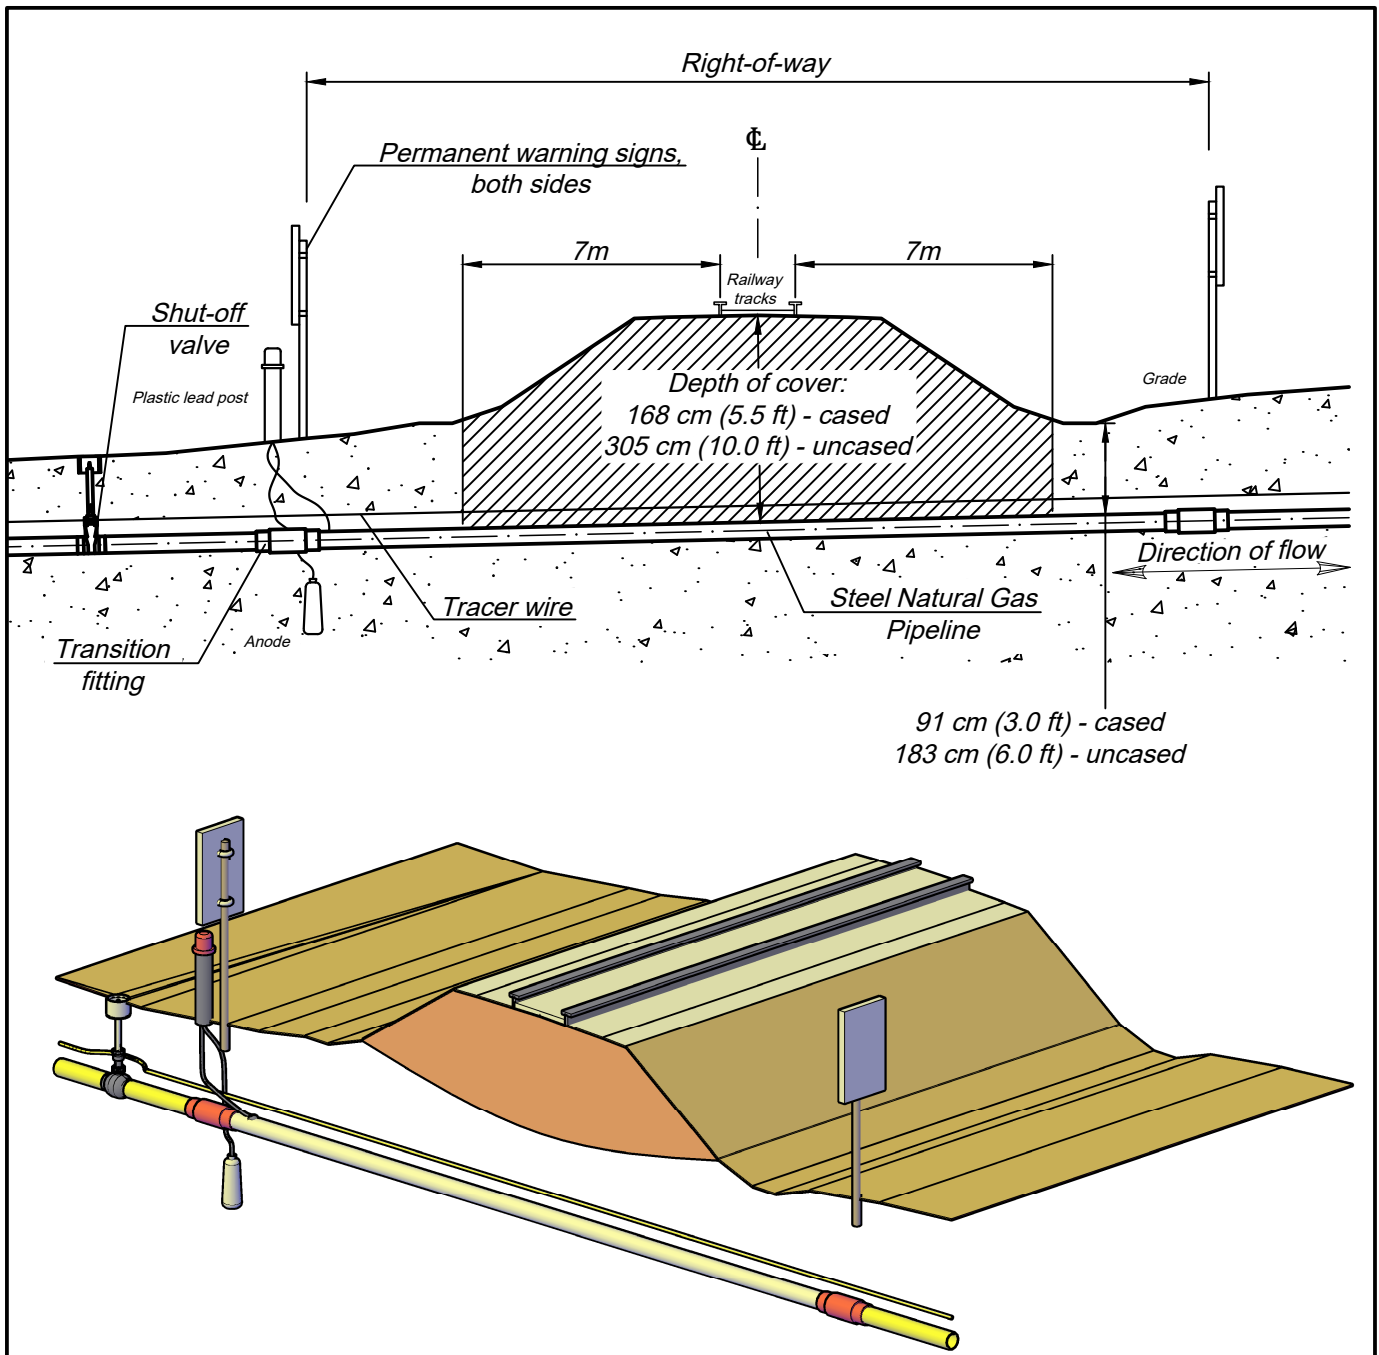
TYPICAL RAILWAY CROSSING
